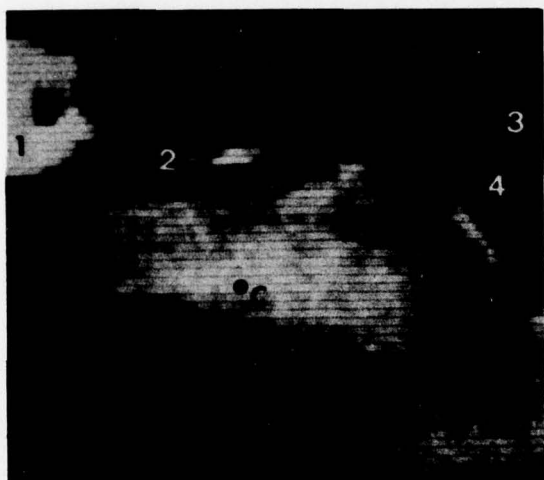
Thermogram of another anomaly along the parapet wall (1 – fan, 2 – drain, 3 – parapet, 4 – flashing).
